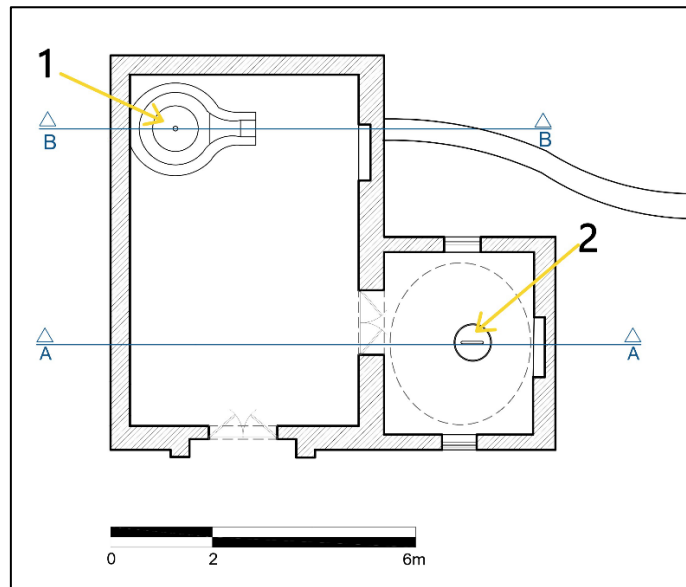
Ground-floor plan representation: 1) Millstone placement; 2) Chah Jeh well.
